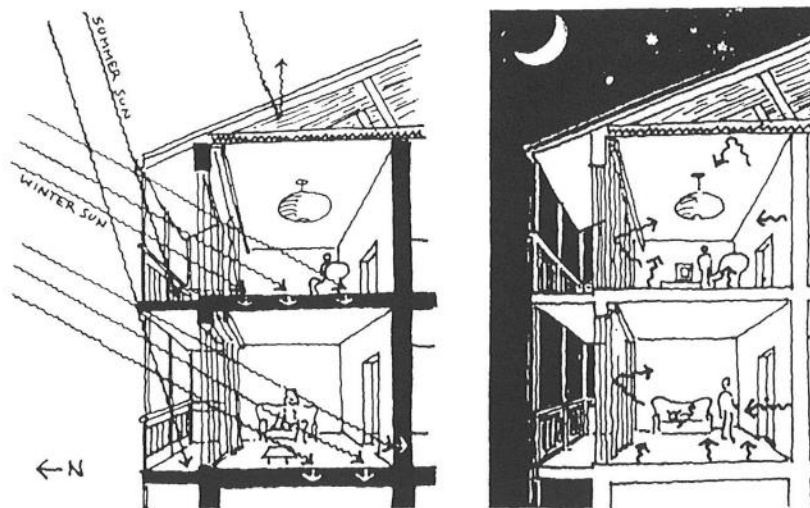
The benefits of orientating living spaces towards north. In summer the interior walls are shaded. In winter, sun enters and warms the internal bulk and concrete walls and floors, which release the warmth in the evening. Curtains and insulation help retain heat.
